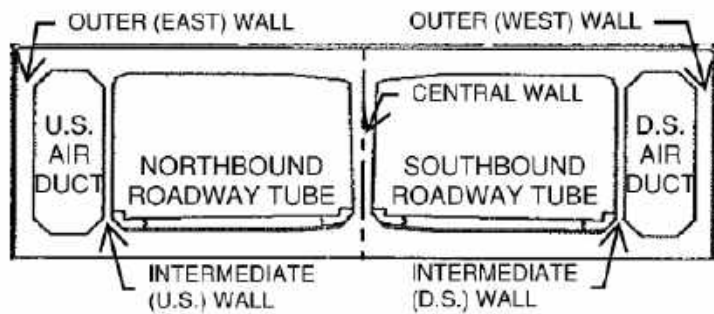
Typical Cross Section of the Existing GMT, as observed from the north, with the Upstream (U.S.) and Downstream (D.S.) Air Ducts and Northbound and Southbound Roadway Tubes labeled.
